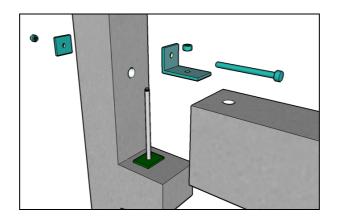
Proposed hybrid beam-to-column connection in precast concrete frame
